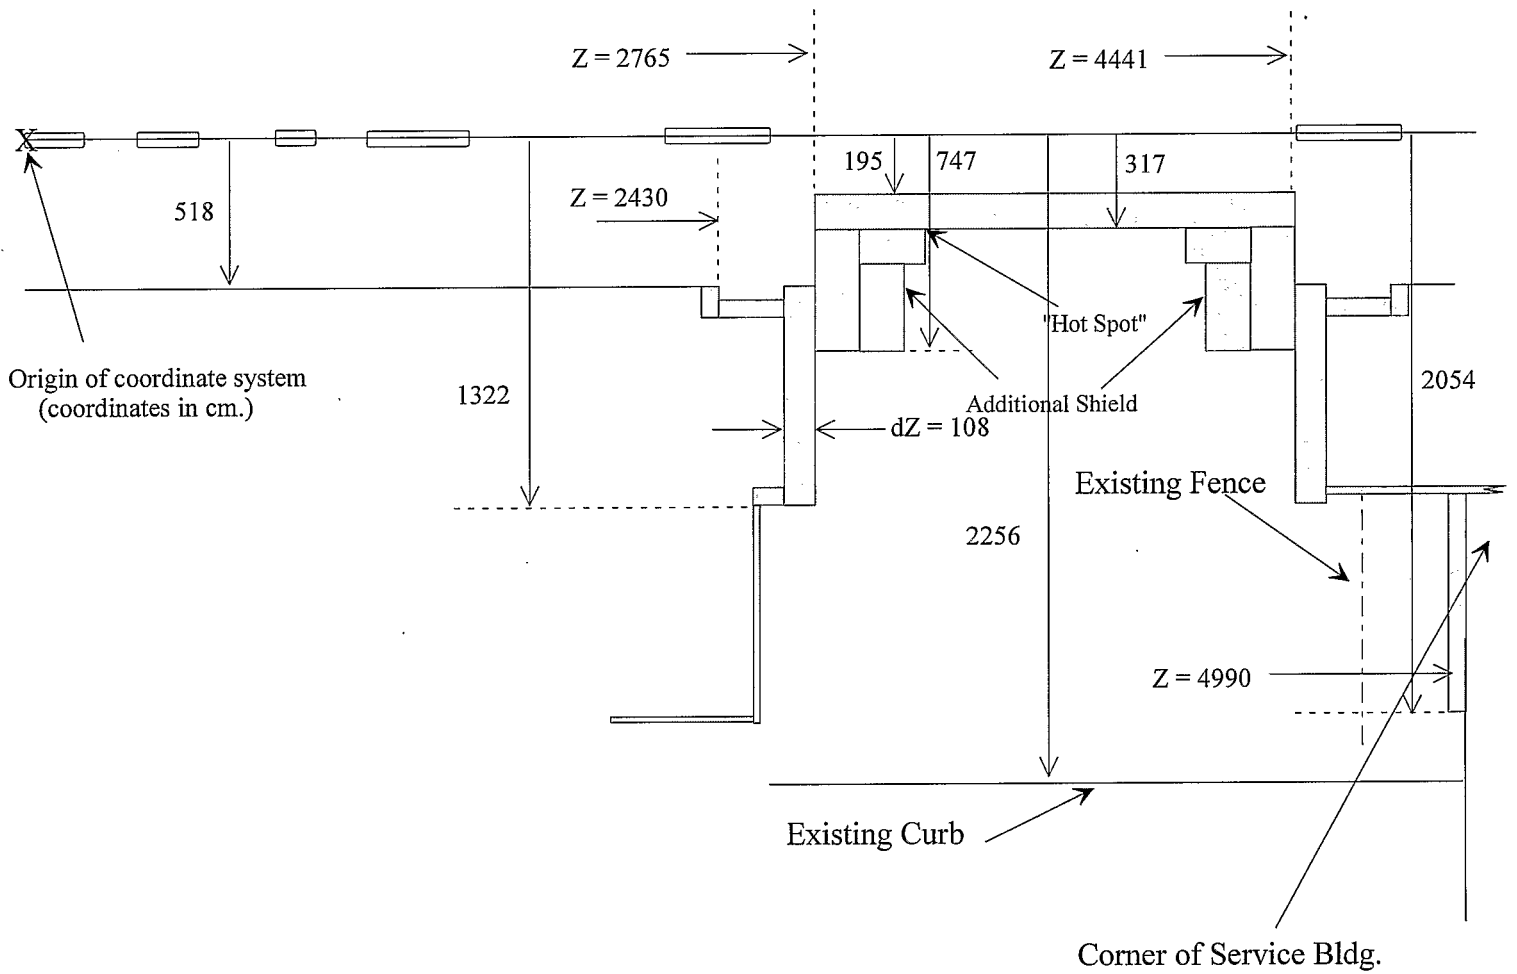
Twelve O'clock Area: Ring Center Side at Beam Elevation with Added Design Shield
